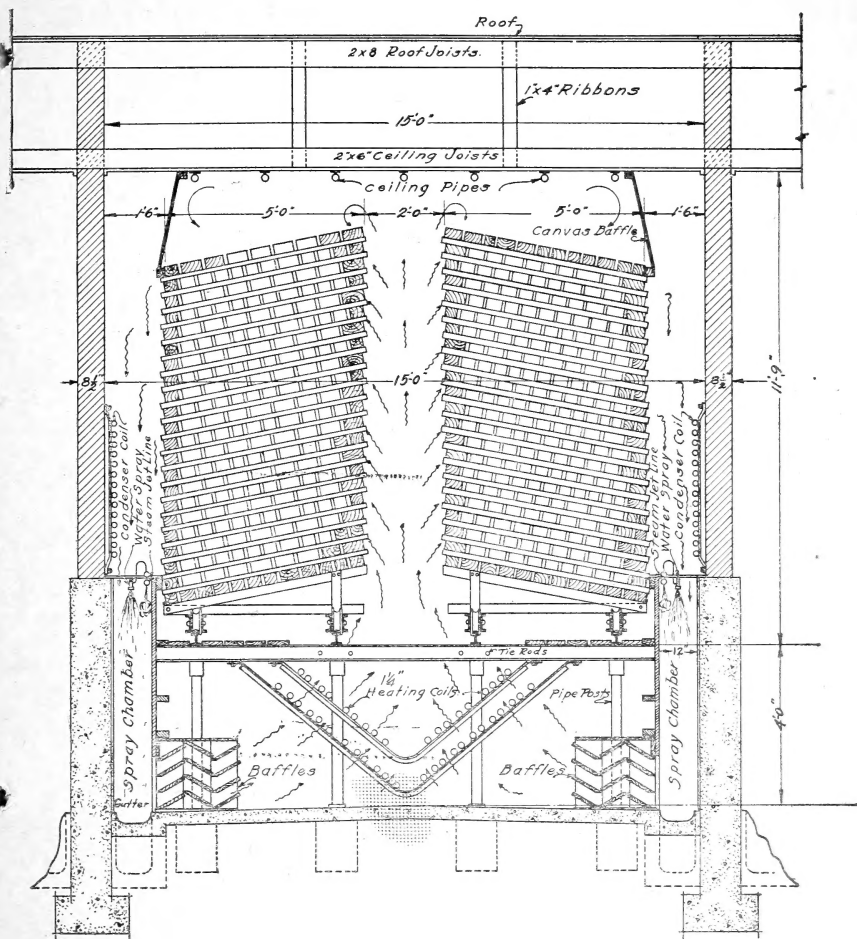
Typical cross section. Brick walls, wood spray chamber, wood roof, and slant piling.
